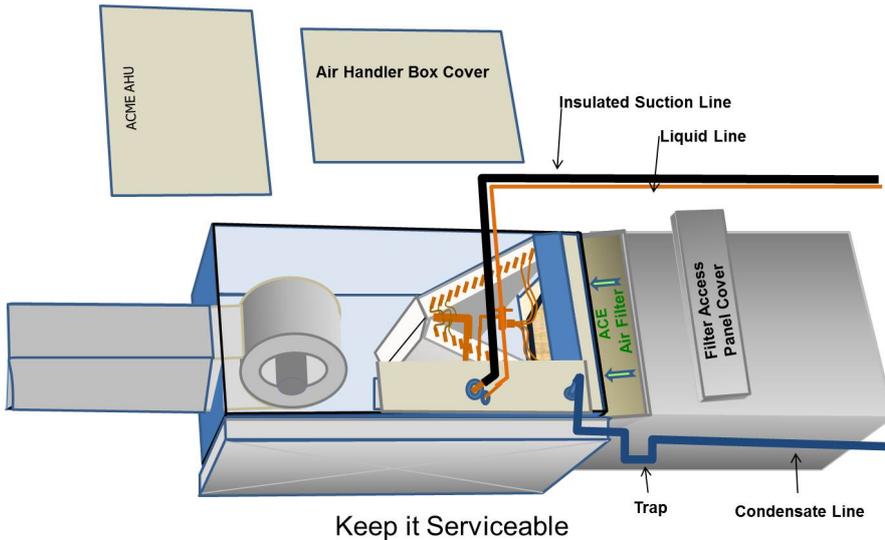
If the system is designed to use a thinner filter, the filter box should be sized appropriately. Install an access panel cover with a gasket and duct tape the edges.
